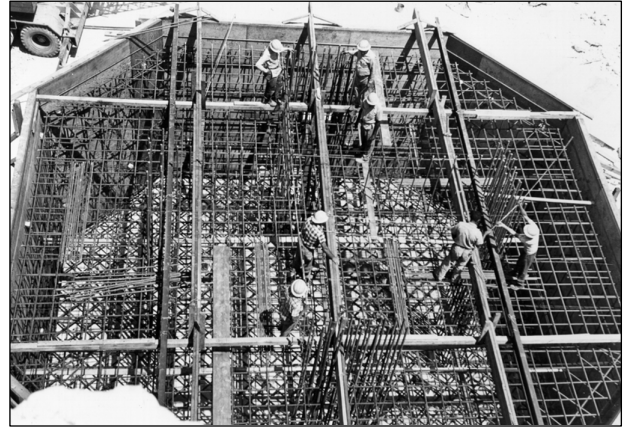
Reinforcement being laid out in the pedestal of Tower 12 in April 1961
